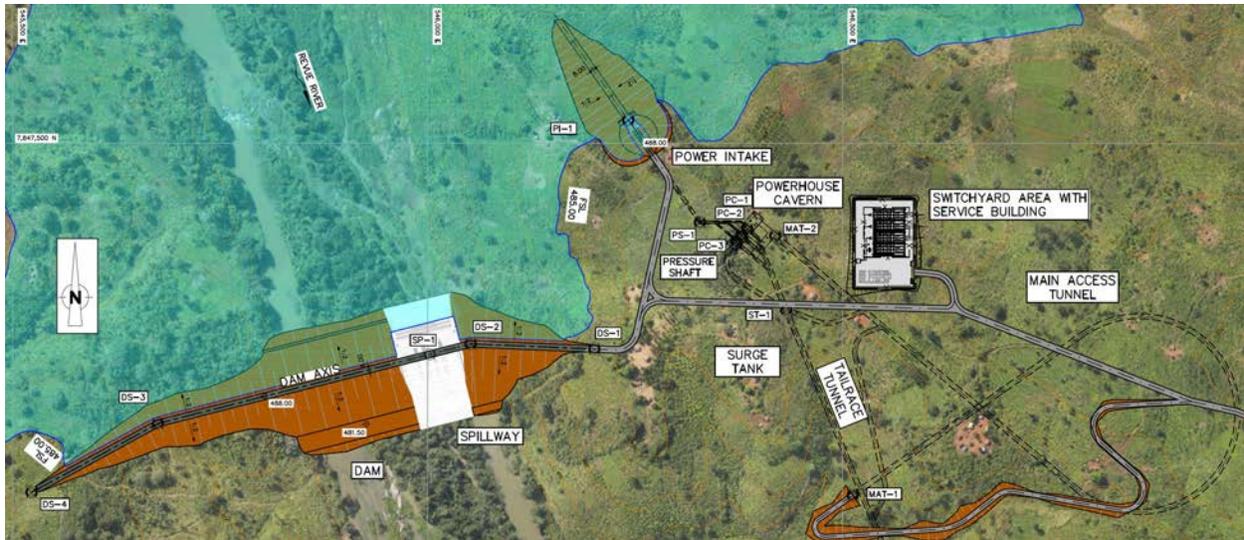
Arrangement of the main structures of the Tsate HPP (without outlet structure)
